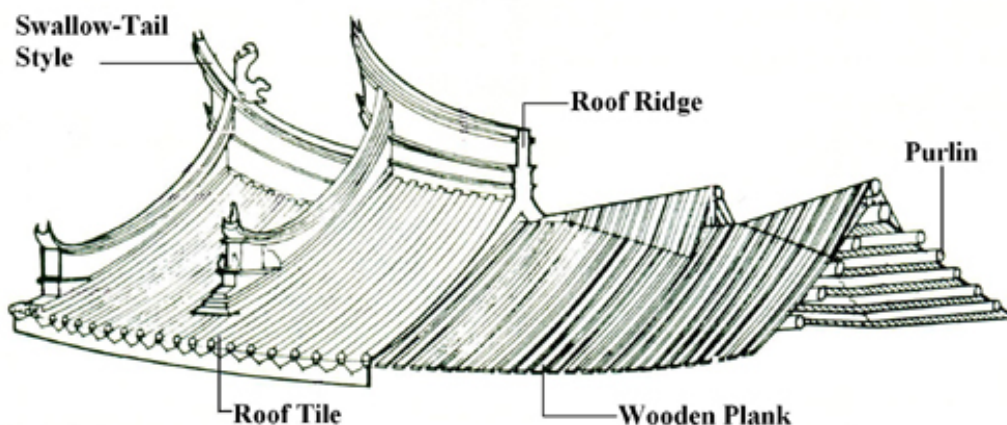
Roof of Dieh-Dou buildings (Lee, 2003)
